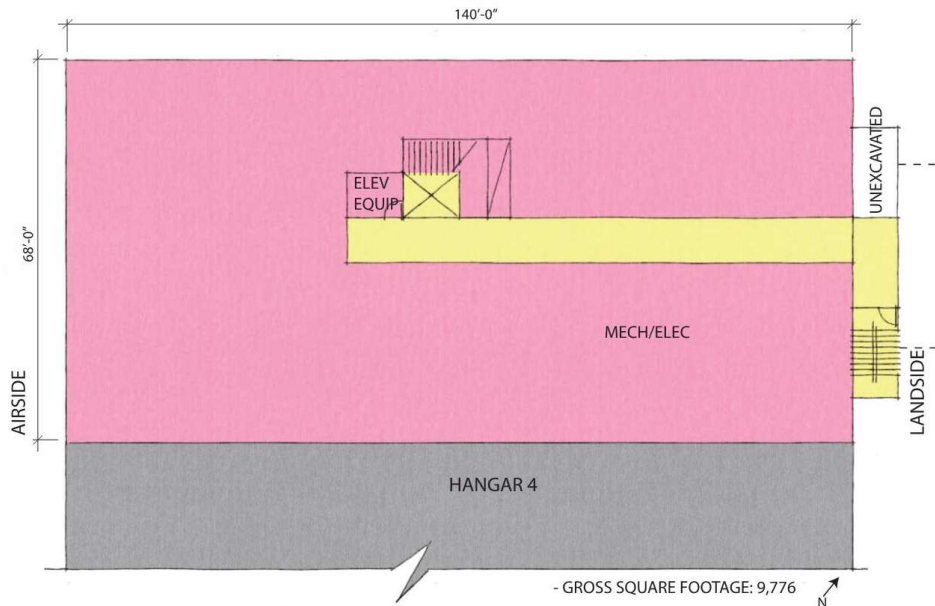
Preferred Concept – FBO Terminal Basement Floor Plan
